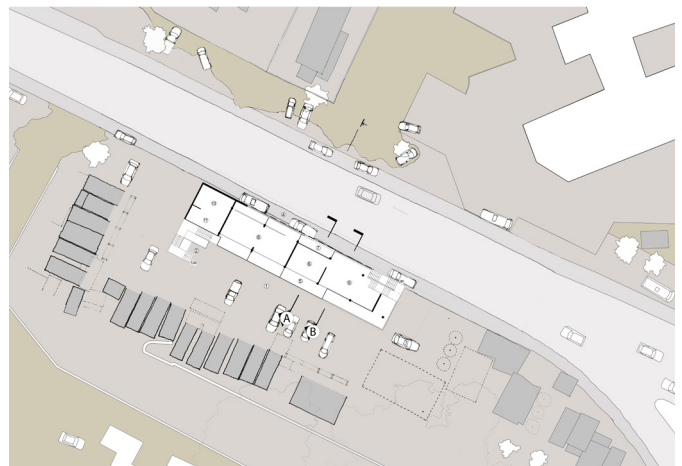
Shared working space, meeting/seminar rooms etc housed on 1st floor above covered openmarket on ground floor
